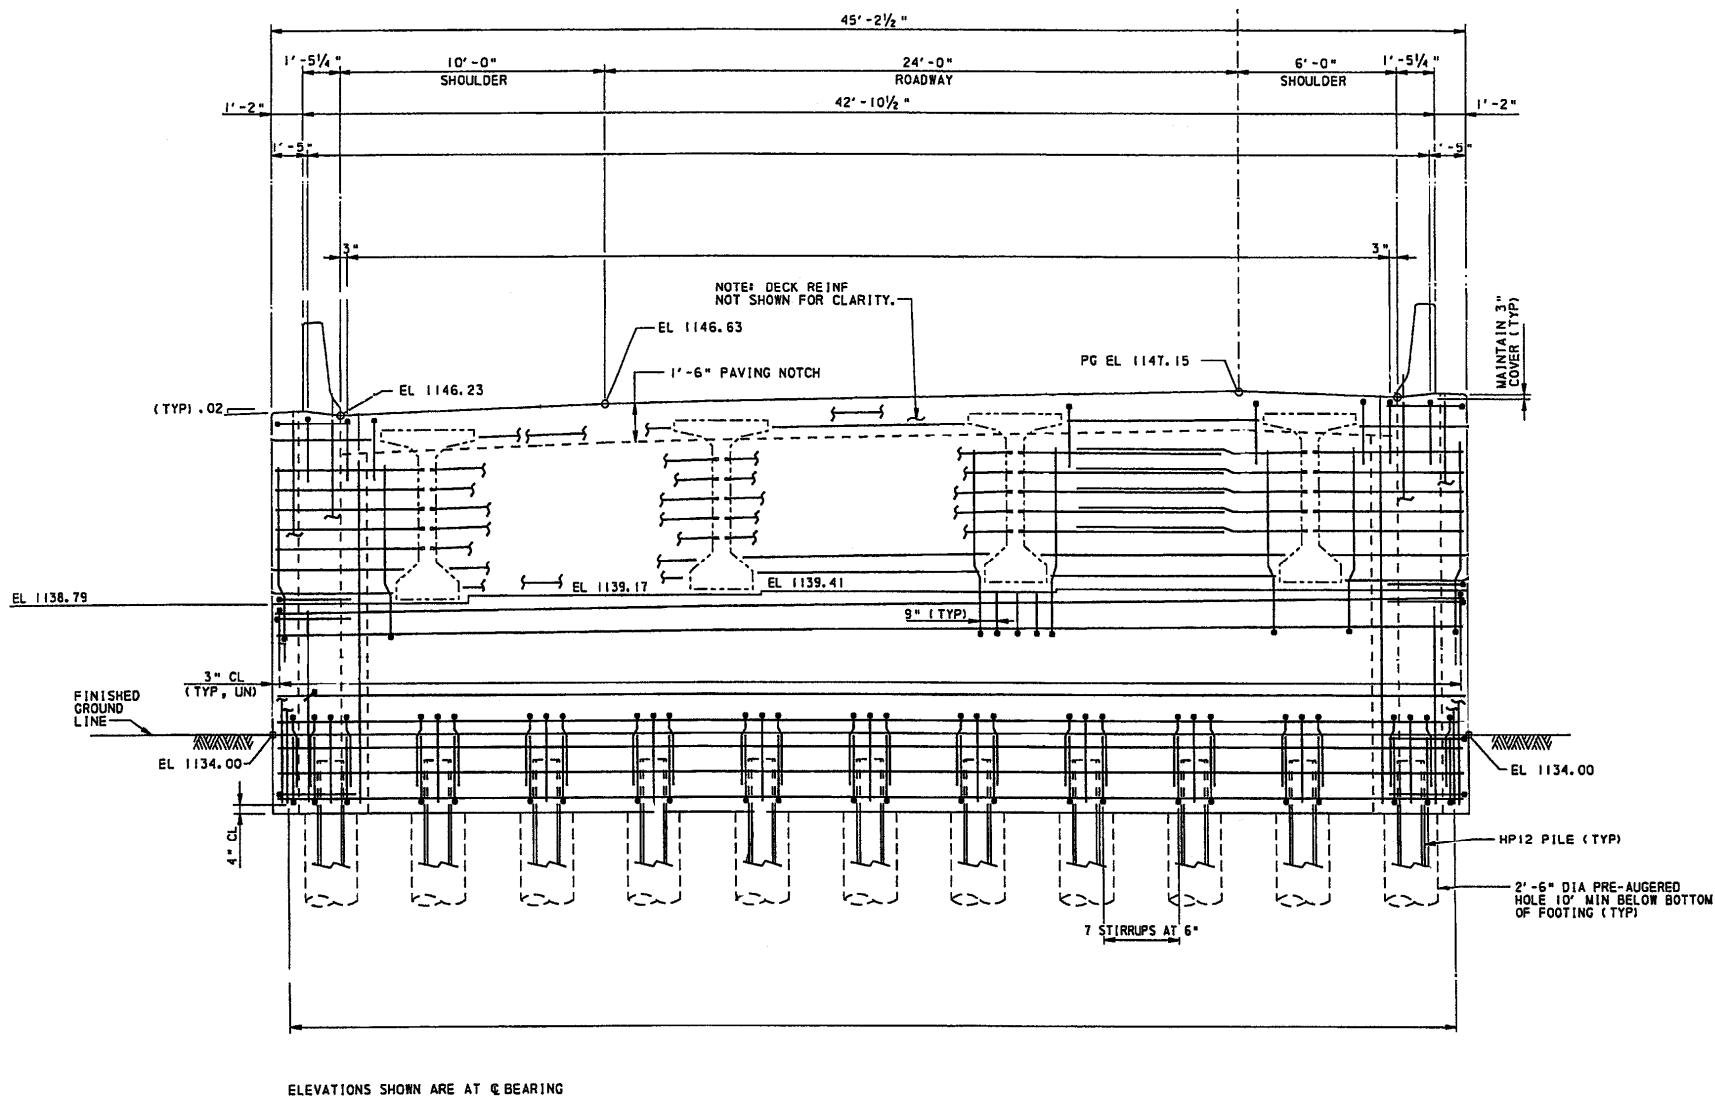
Elevation of Bridge 211 Abutment 1.
